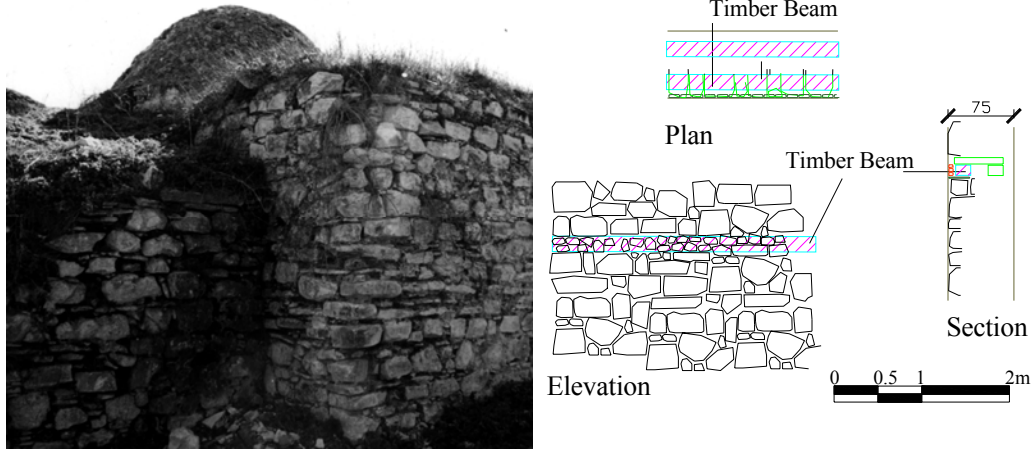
Urla Çifte Hamamı, Northwest elevation, Rubble stone bond
